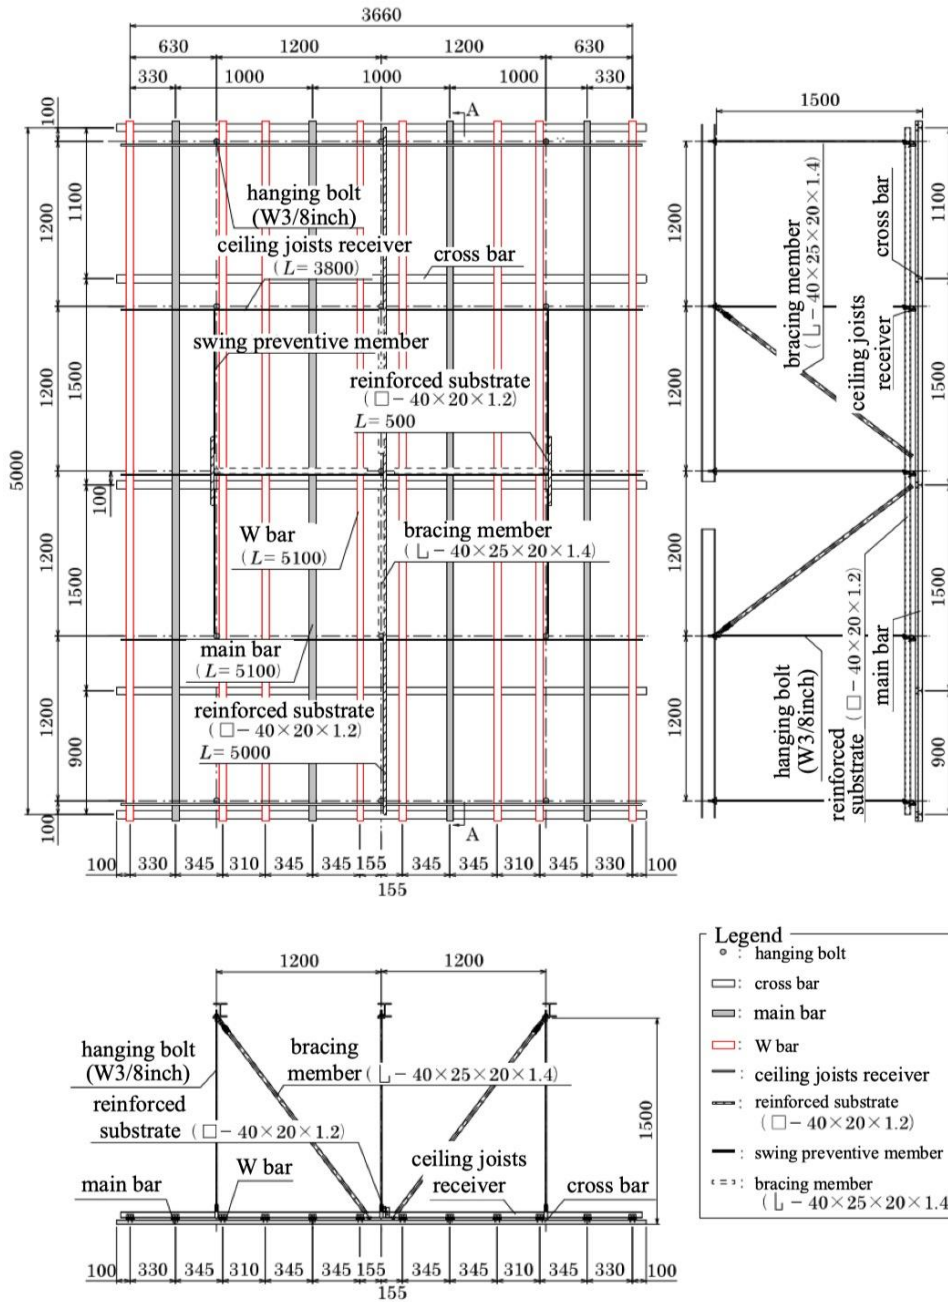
Ceiling unit (1000 × 1500-C) (dimension: mm)
